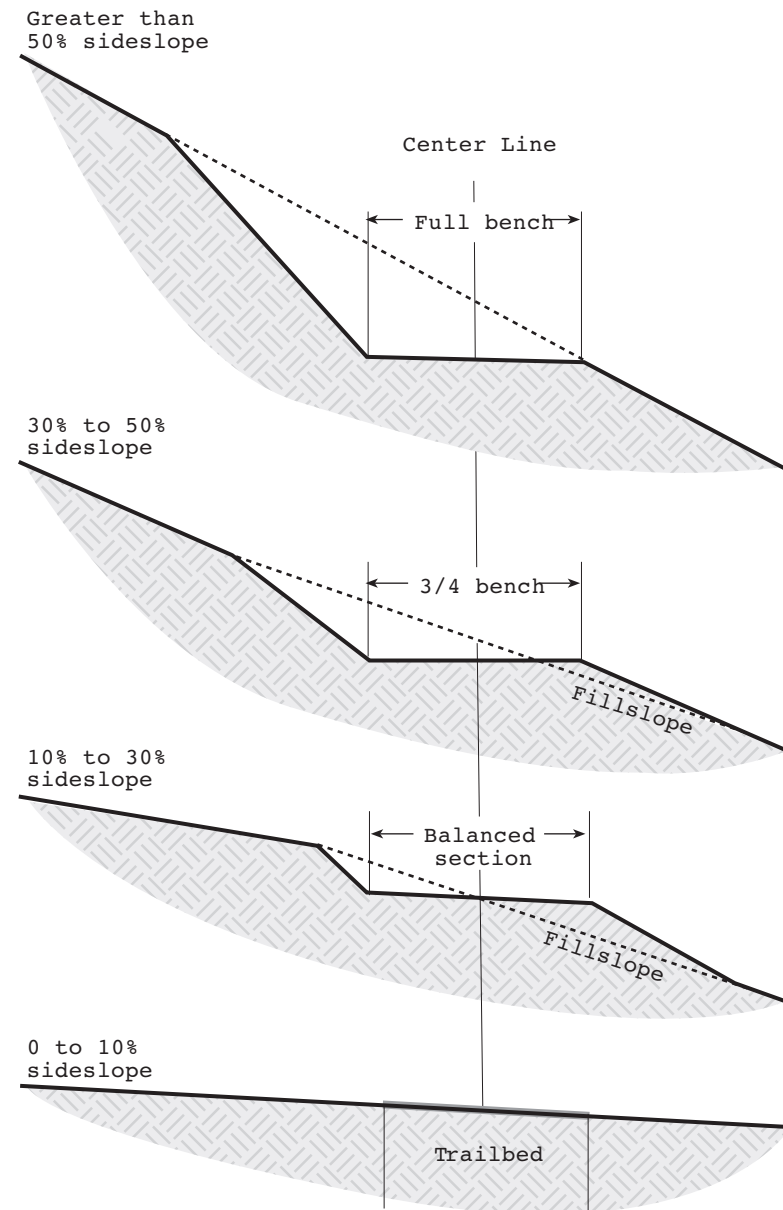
Typical trail cross sections. (*Trail Construction and Maintenance Notebook*, 2000)
